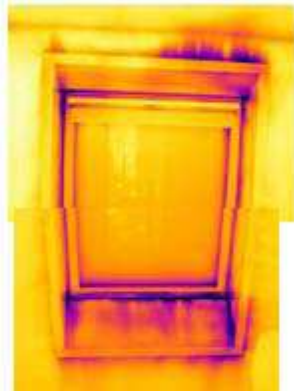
Thermo image of a window in an inclined wall and leakage of air tight barrier (Blower-door test by Lars Due, 2009)
